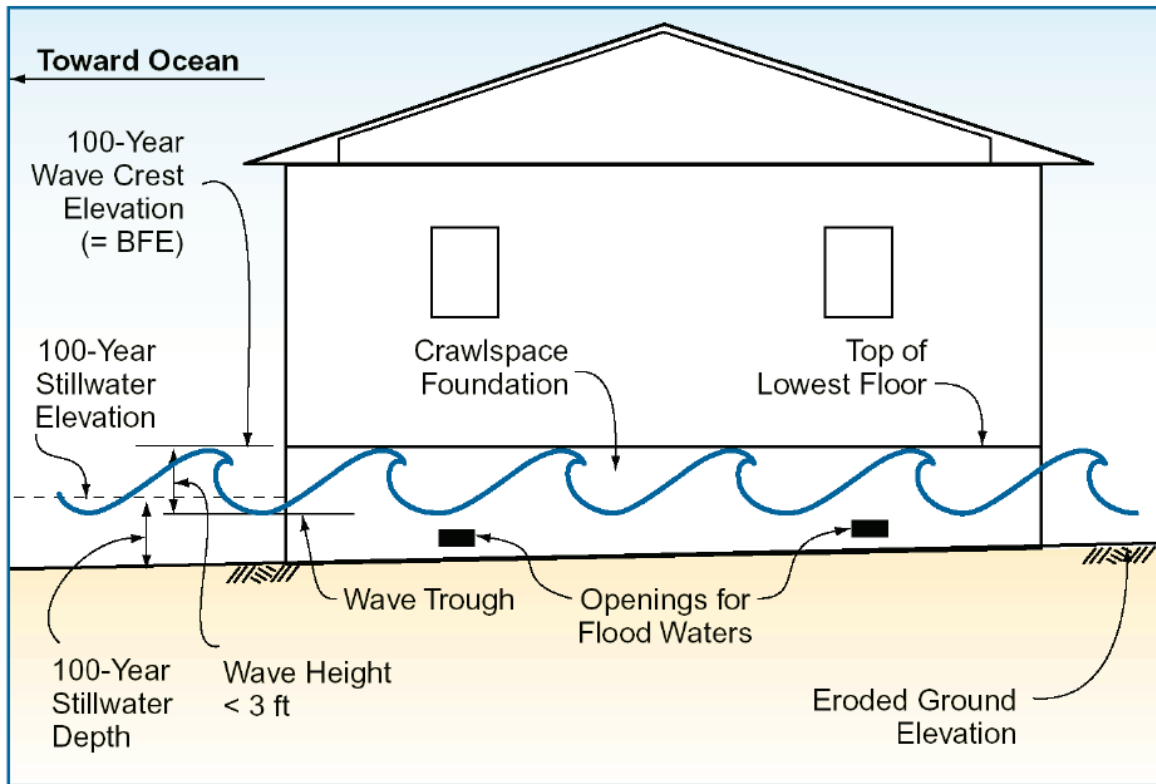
National Flood Insurance Requirements for the A-AE (Flood) Zone (From FEMA CCM). Under the National Flood Insurance Program, structures must be elevated above the Base Flood Elevation, and supporting walls must have openings to allow entry and exit of flood waters.
